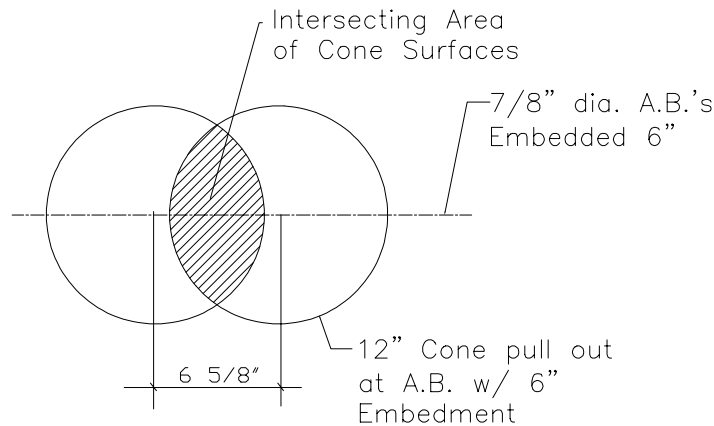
Intersection of anchor bolt tension failure cones
